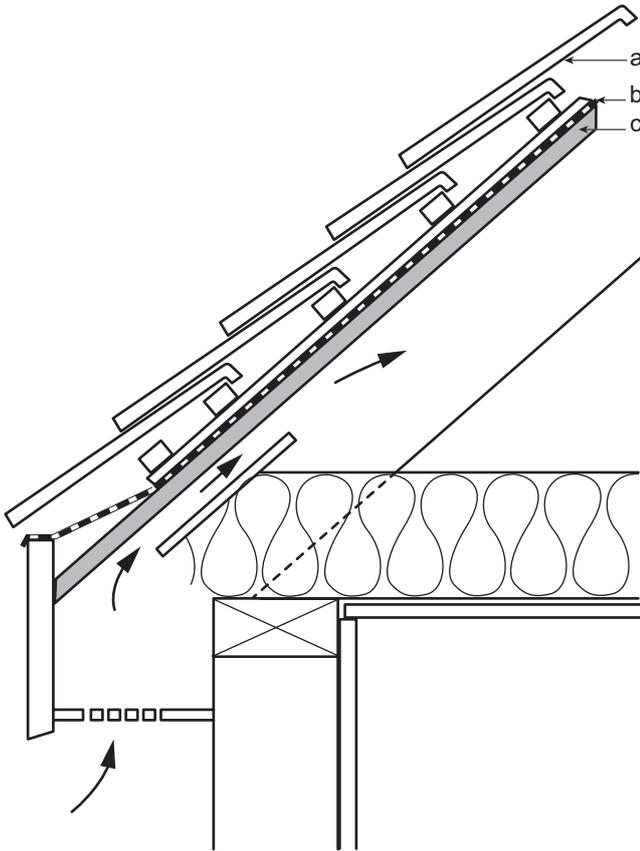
Example of a cold roof space with insulation at ceiling level. The roof space must be adequately ventilated
